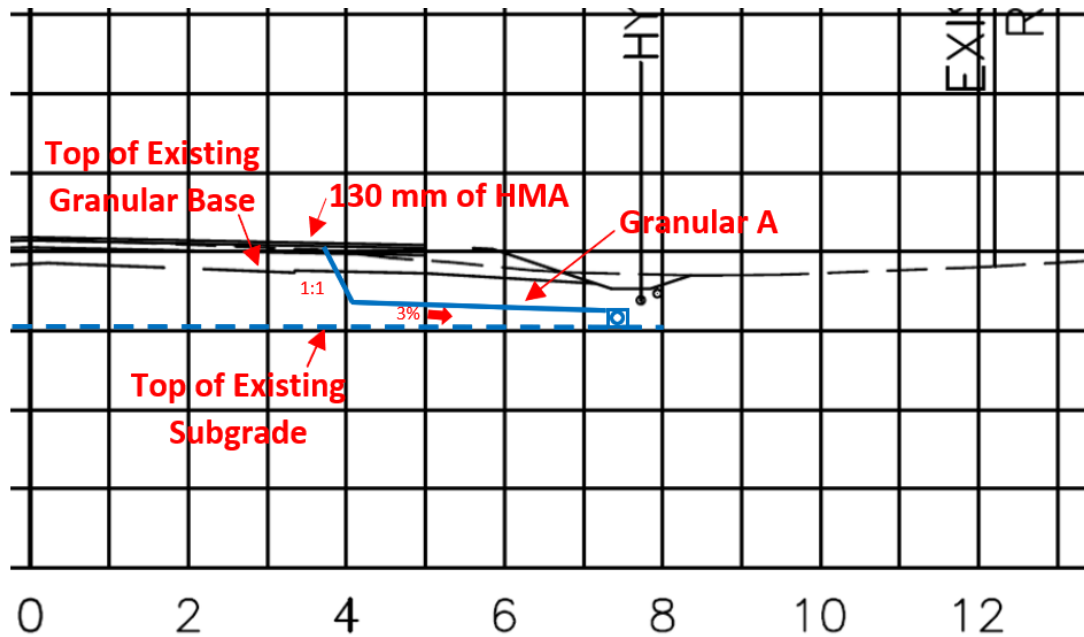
Typical Conventional Pavement Widening Cross-Section
